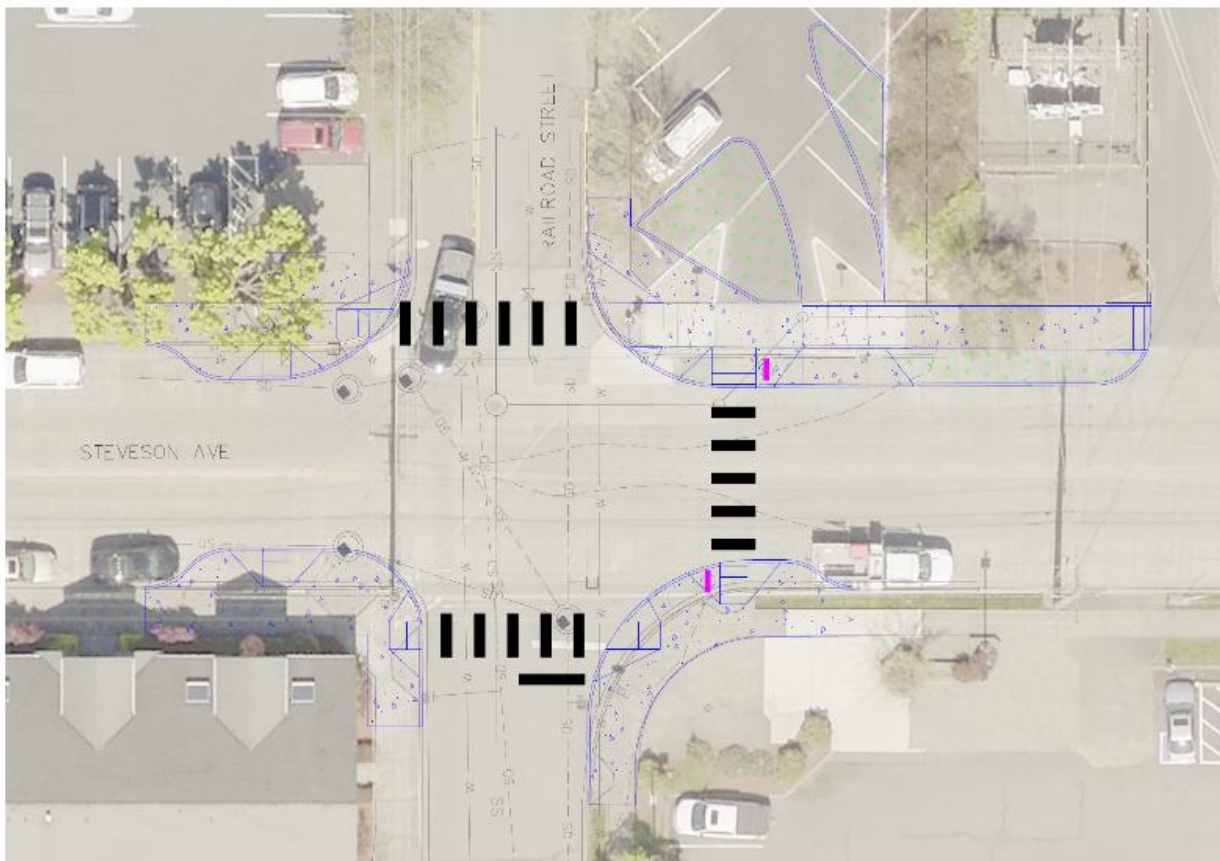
Stevenson Ave / Railroad Street Conceptual Intersection Improvements
